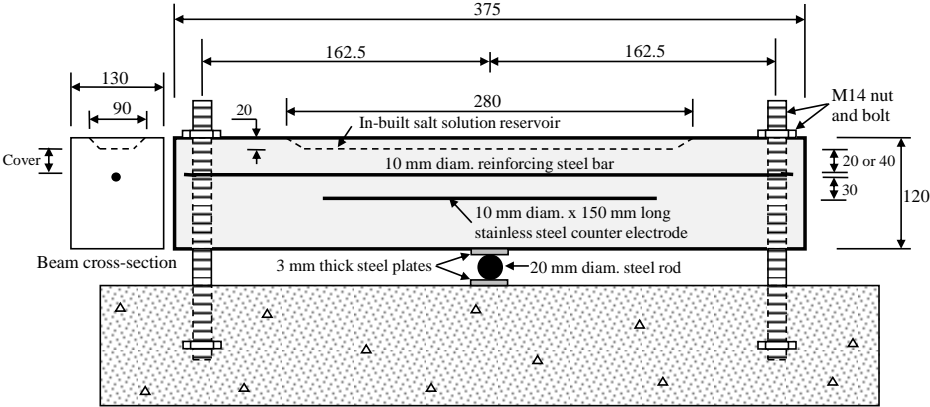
Beam loading set-up for 0.4 and 0.7 mm cracked specimens (dimensions in mm)
